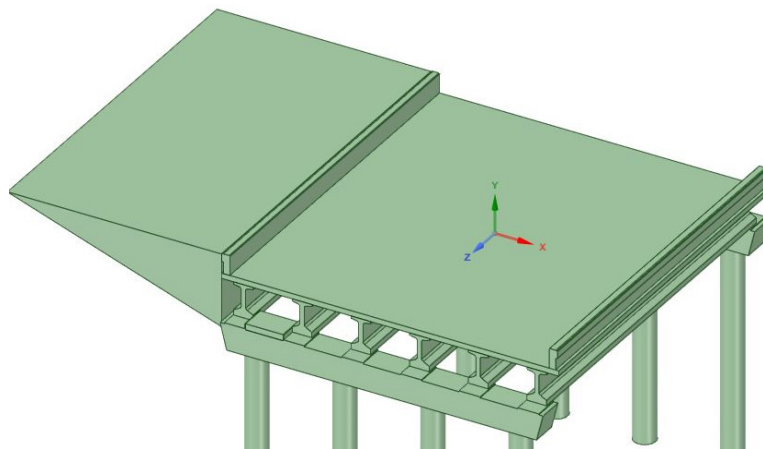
I-girder bridge with wedge shape debris (elevation)
